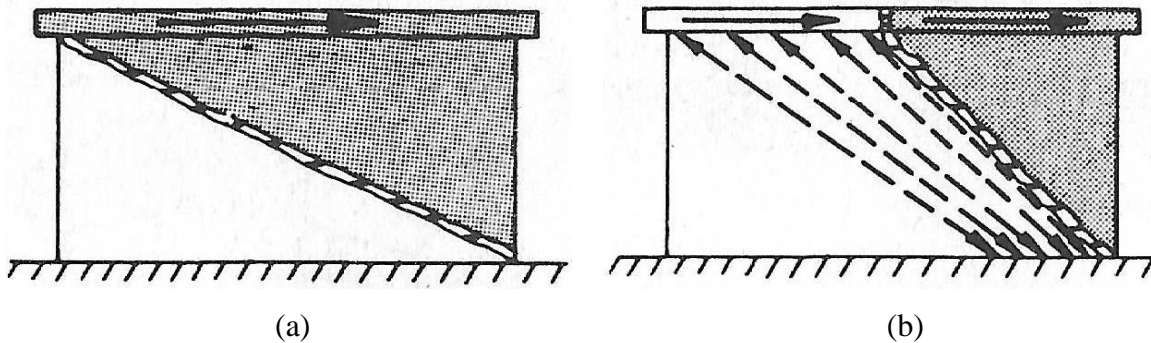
Diagonal tension failure modes (Paulay et al., 1982): (a) corner-to corner crack; (b) steep-angle crack.
